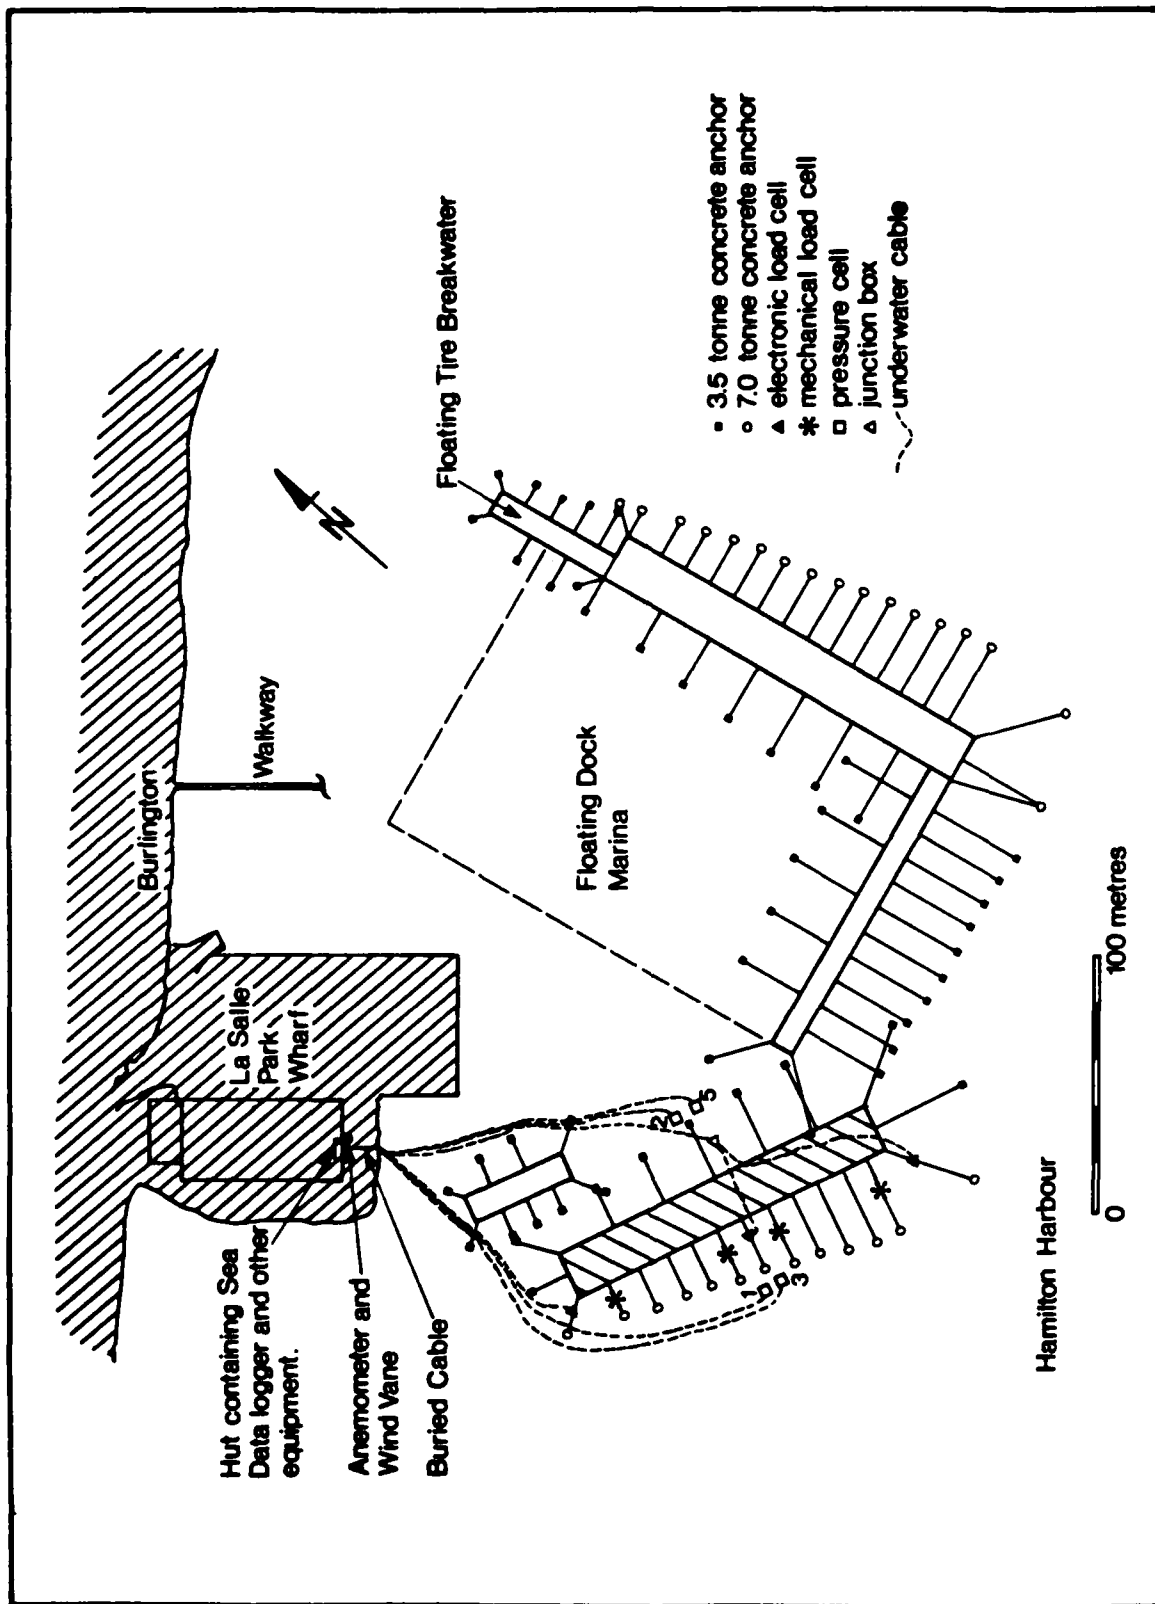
Layout of Instrumentation for La Salle Park Field Monitoring Study
